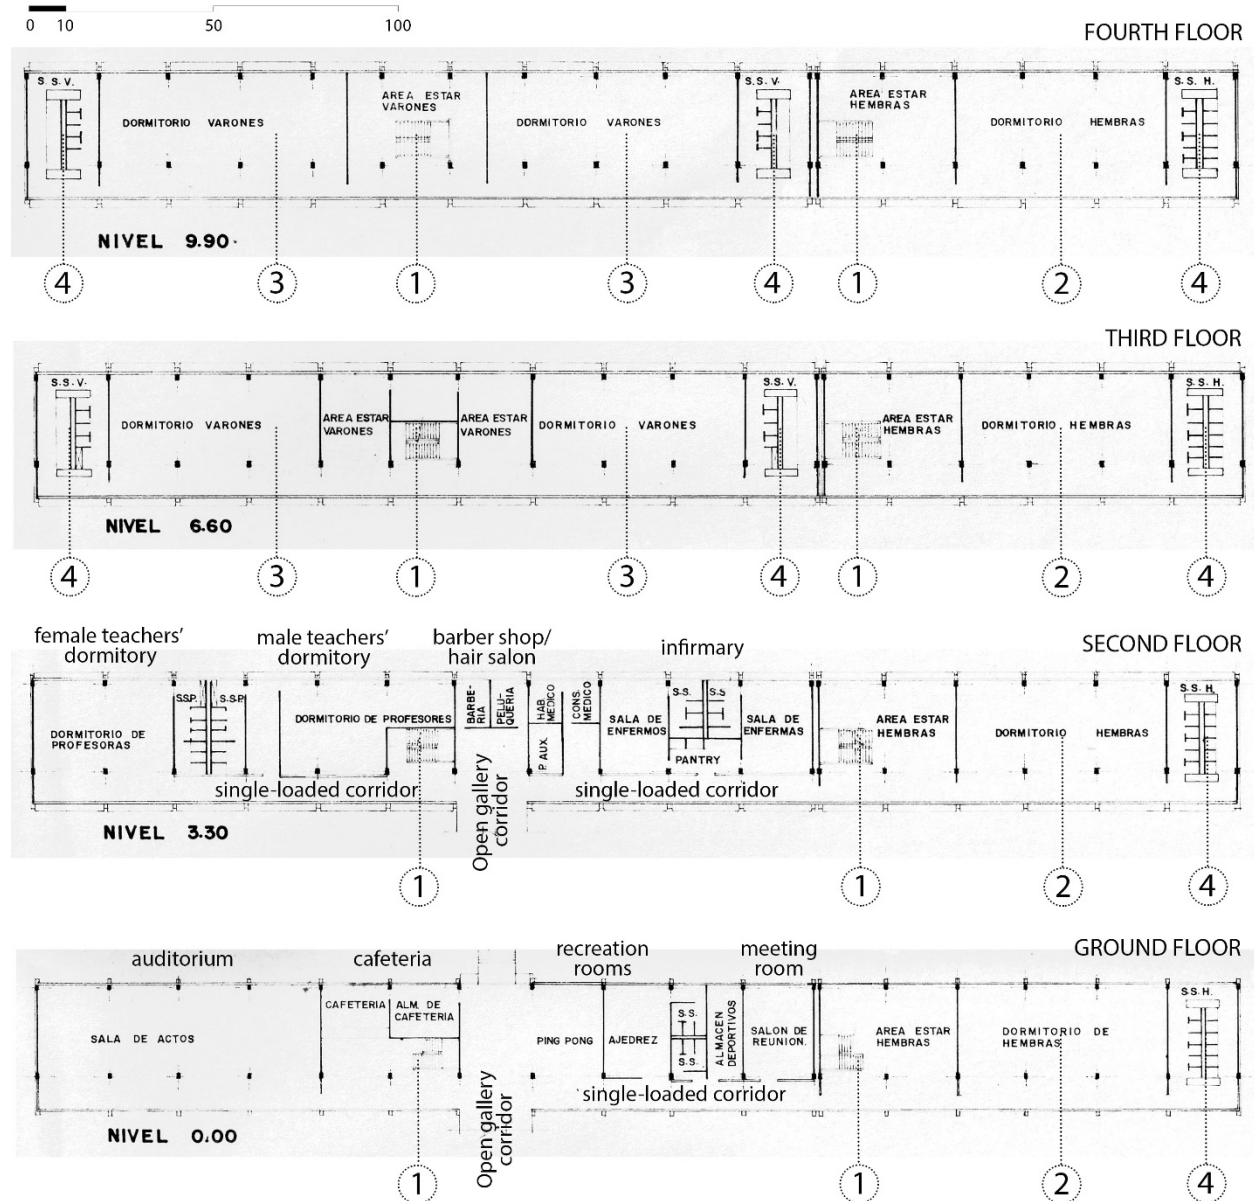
Floor plans of the dormitories block indicating 1) stairs; 2) girls' dormitories; 3) boys' dormitories; 4) dormitory's bathroom. Source: Ministerio de la Construcción, Josefina Rebellón's personal archive.
